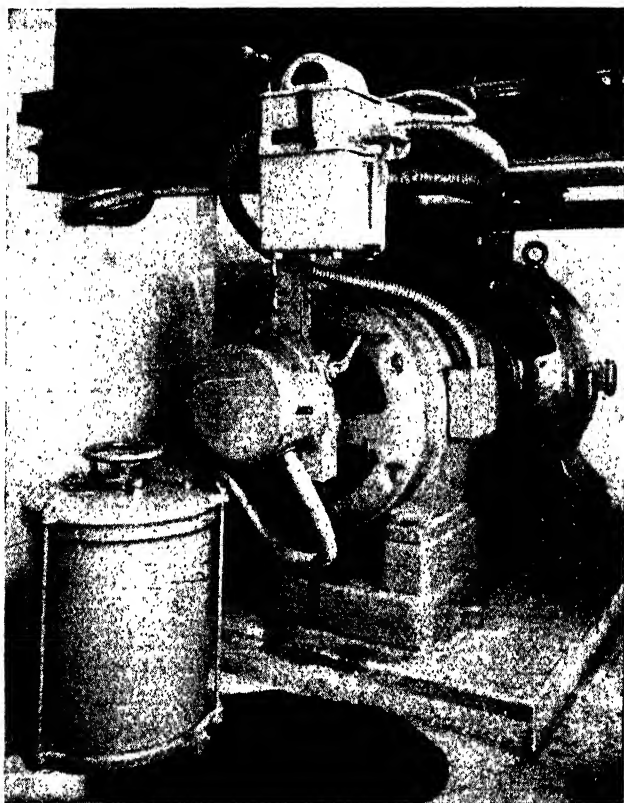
MOTOR-GENERATOR SET, SHOWING FLEXIBLE TUBING CONNECTIONS TO CONTROL GEAR.
